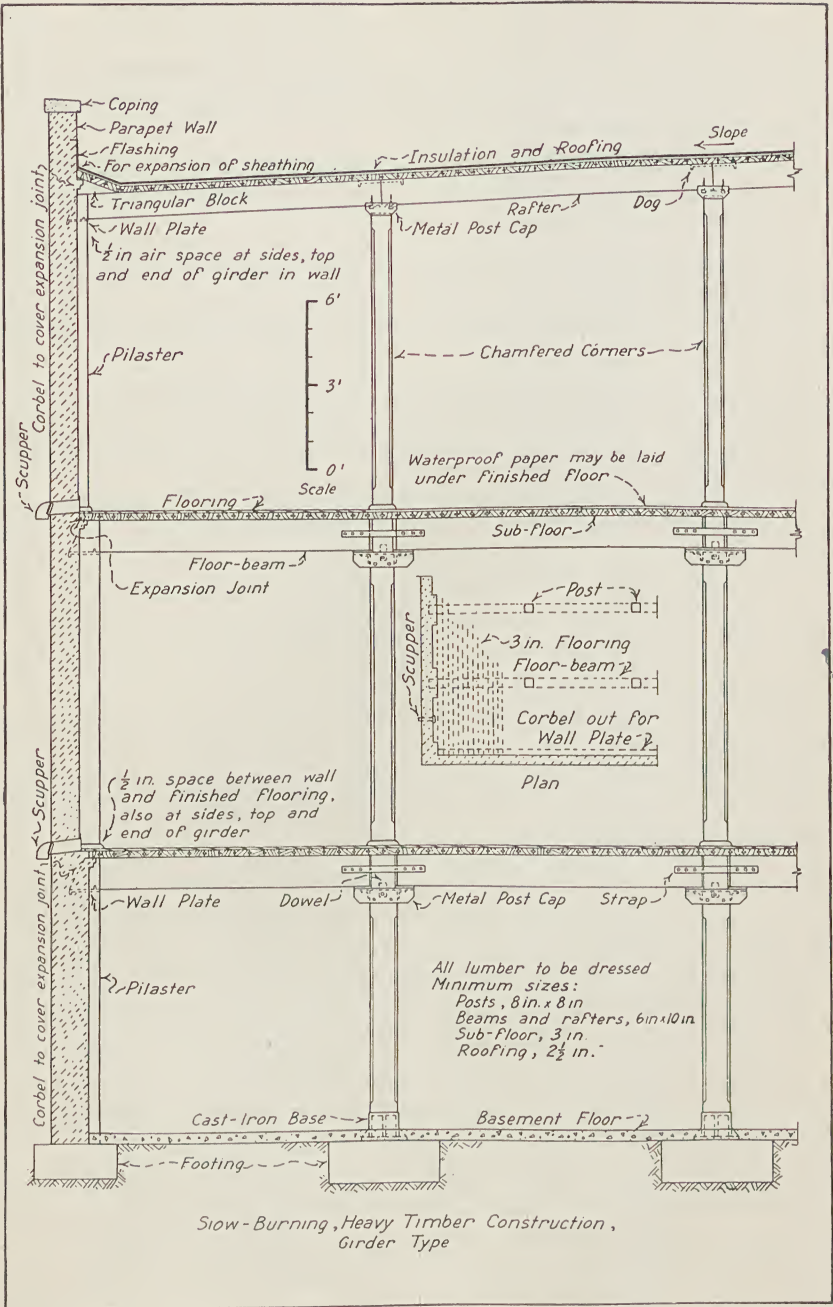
Slow-burning, Heavy Timber Construction, Girder Type
